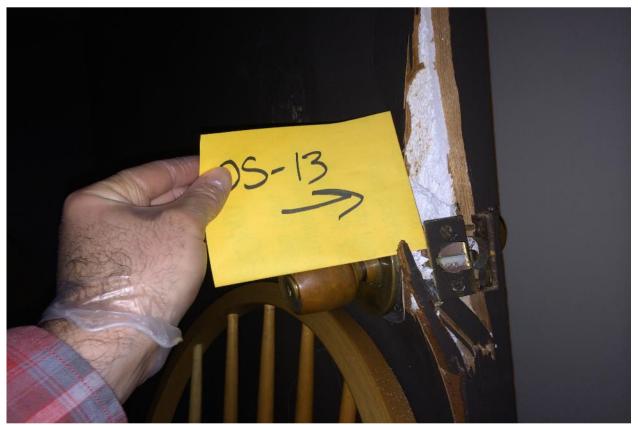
Laboratory analyses detected 60% chrysotile asbestos and 30% amosite asbestos within central room fire door sample DS-13 collected from the Dormitory Building central room door.
